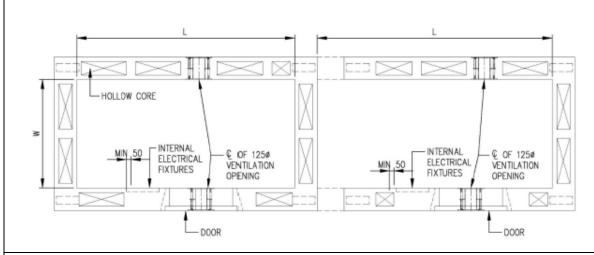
F – Precast HS And C-Shaped Precast HS Connected At The Shorter Wall And With HS Door On Longer Walls
